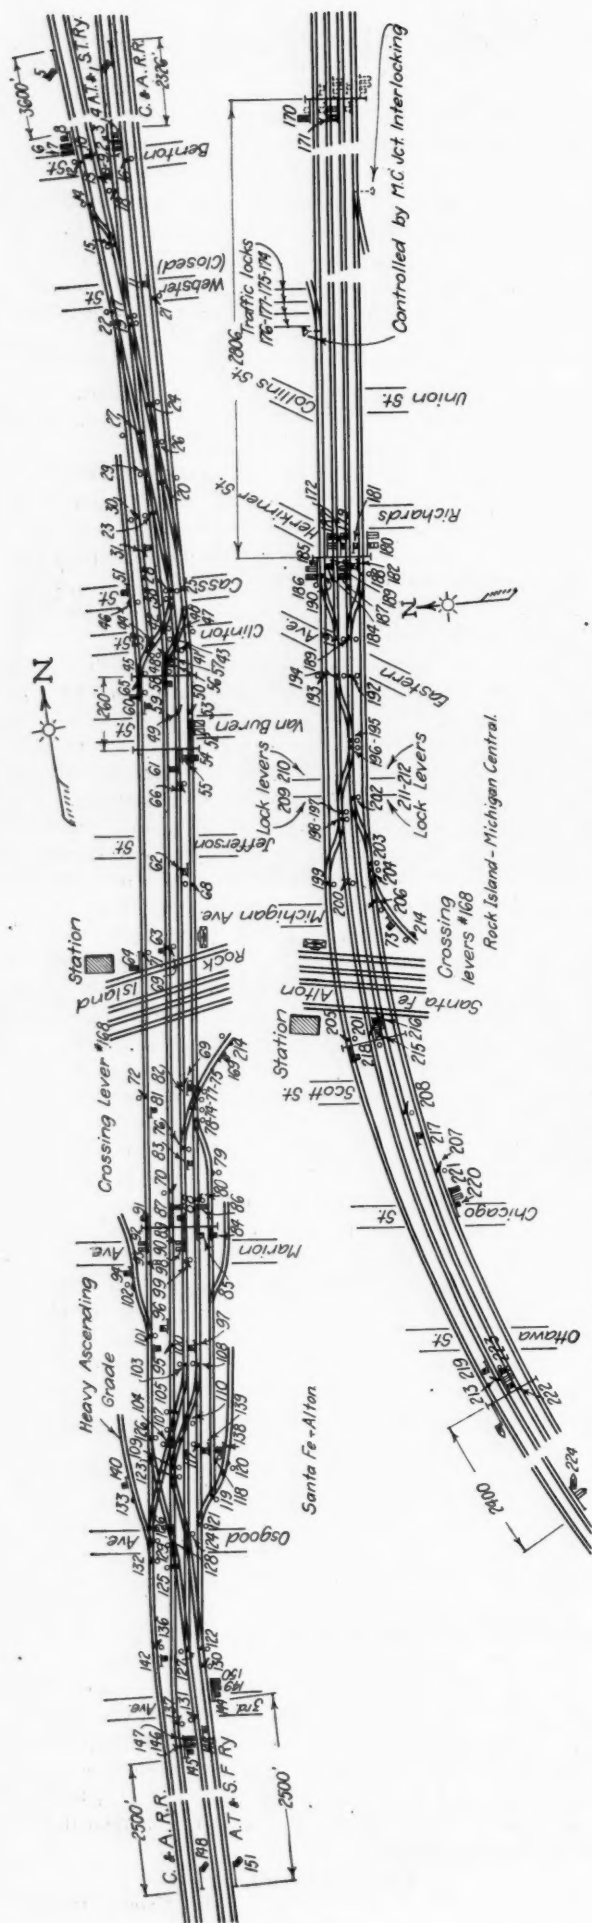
General Layout of Tracks, Joliet Interlocking, Chicago, Rock Island & Pacific Railway
